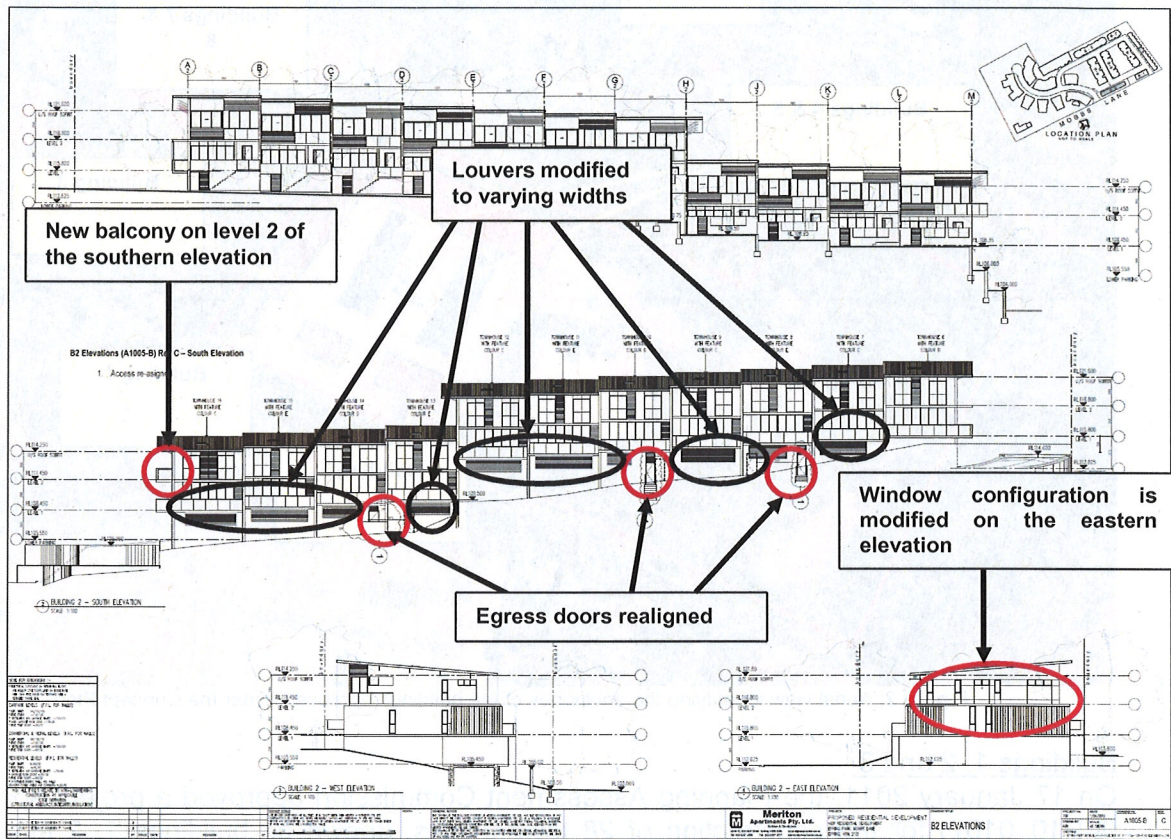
Proposed Modifications to the Southern and Eastern Elevations
